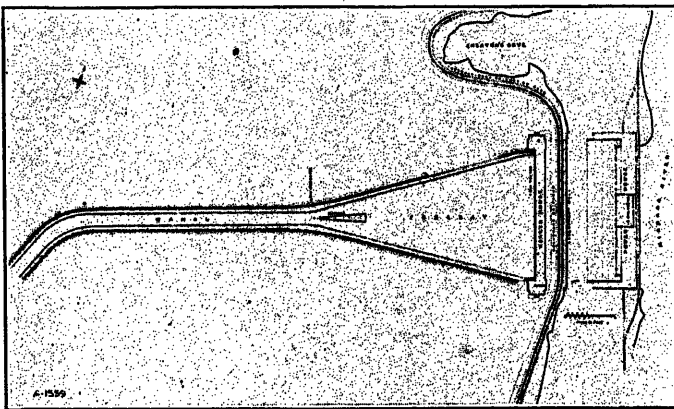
GENERAL PLAN OF FOREBAY AND POWER HOUSE
